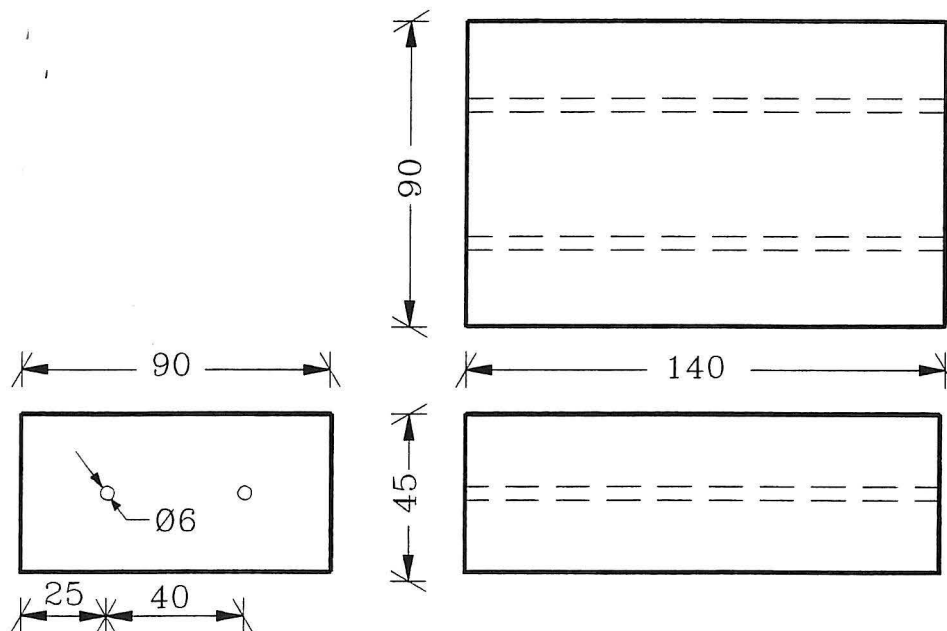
Measurement of timber specimens used in the series 23 to 34. Dimensions in mm.
